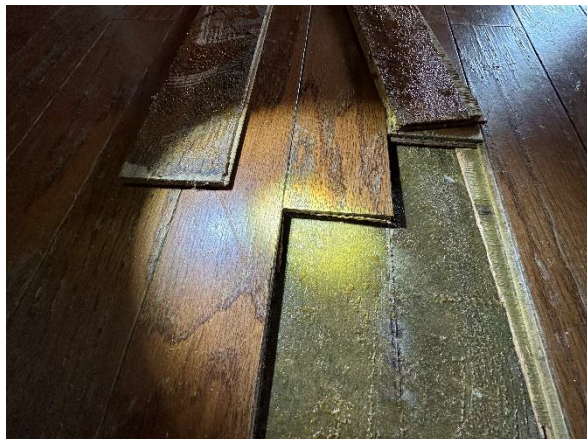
HA-9: Mastic associated with 3"x36" wood flooring
